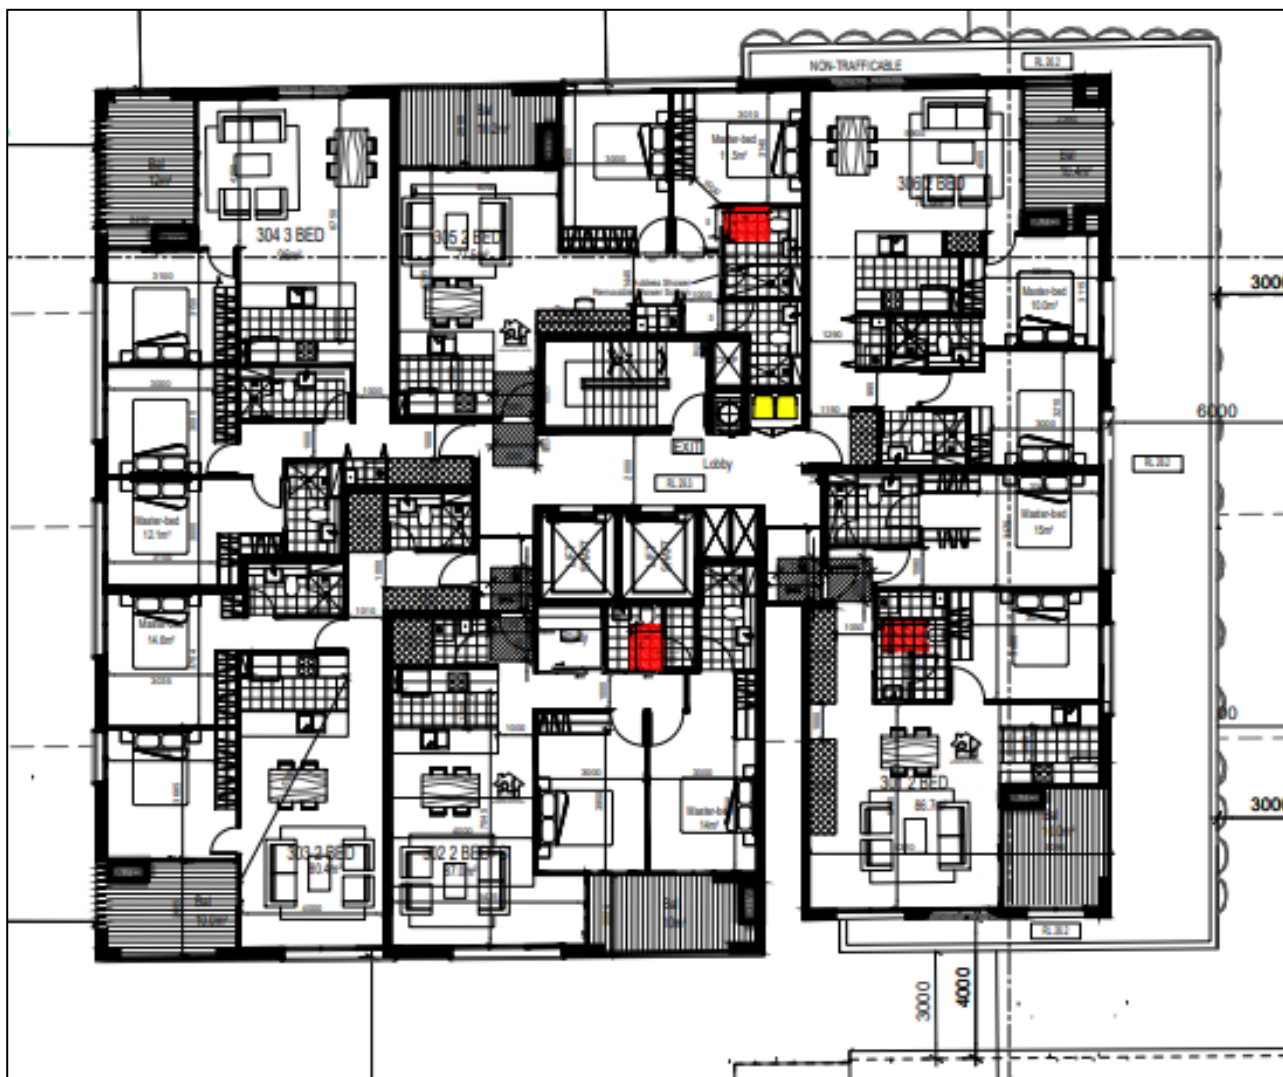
Extract of applicants submitted Level 3 Floor Plan.
